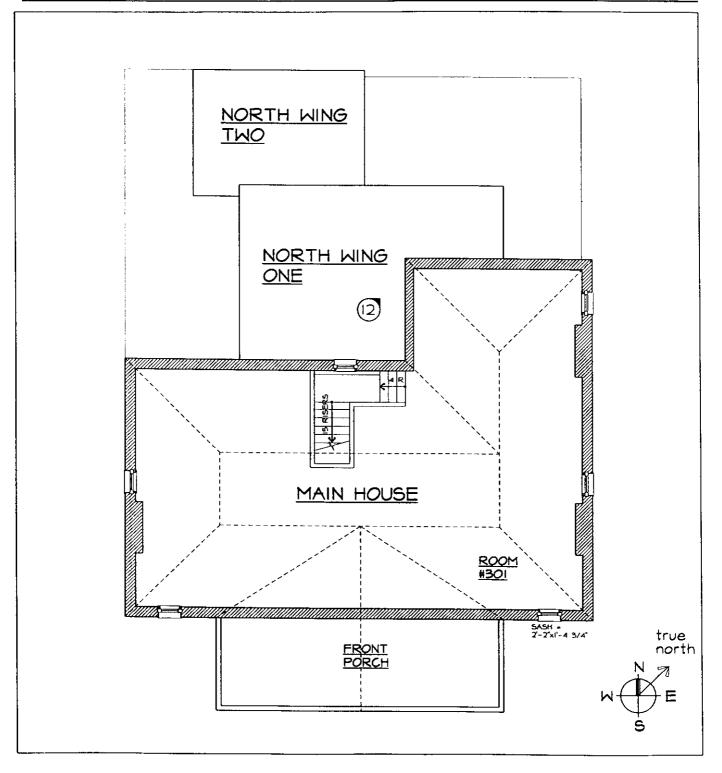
Existing Second Floor Plan, Scale : 1"=10'
